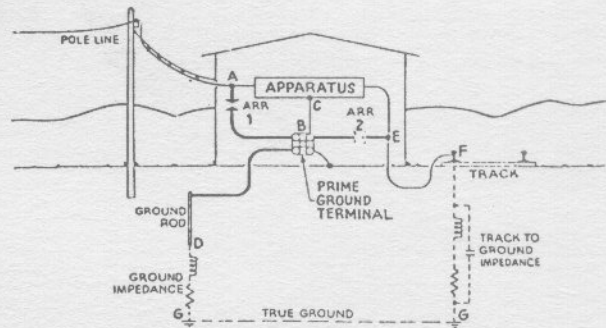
Simplified arrangement showing connection of apparatus and arresters to prime ground terminal in equipment housing.
